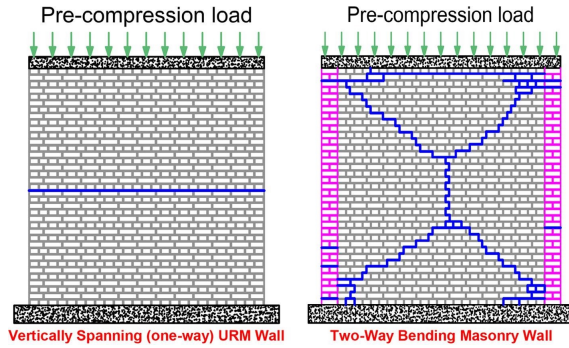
Out-of-plane collapse of masonry walls in one-way or two-way bending. From [60].
